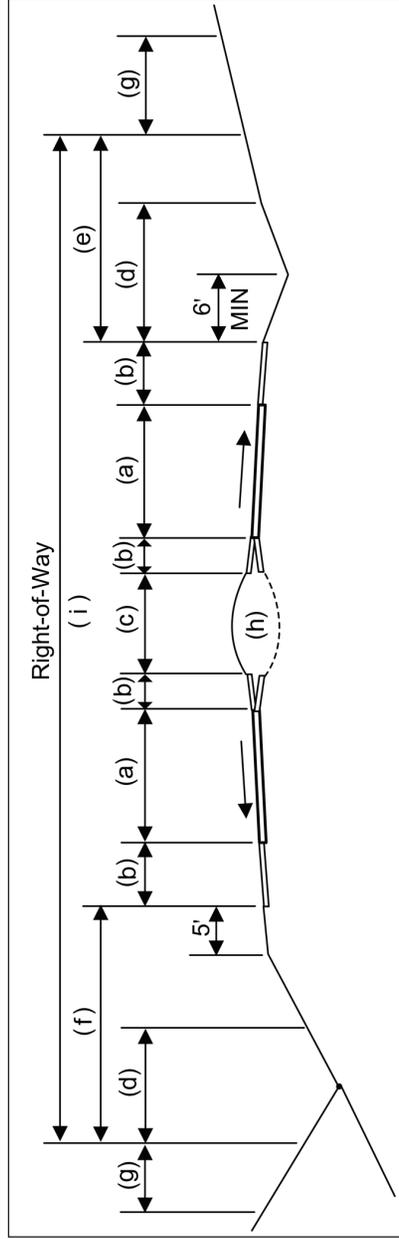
Cross-Section -- Parkway with Reinforced Shoulder, Drainage Away from Median
